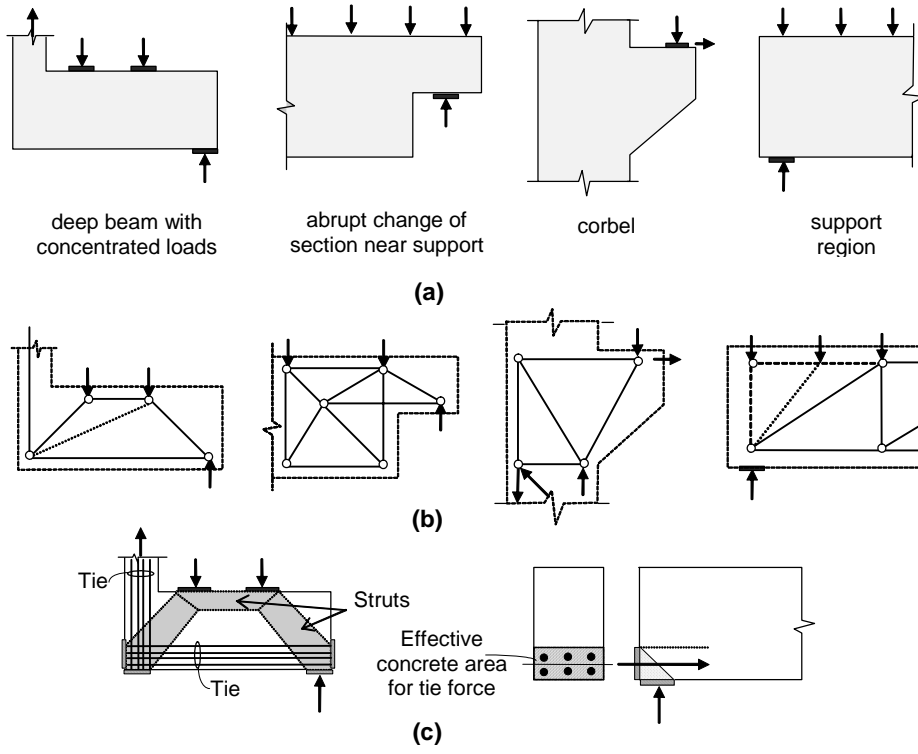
Examples of the *strut-and-tie* (truss) concept of load transfer
